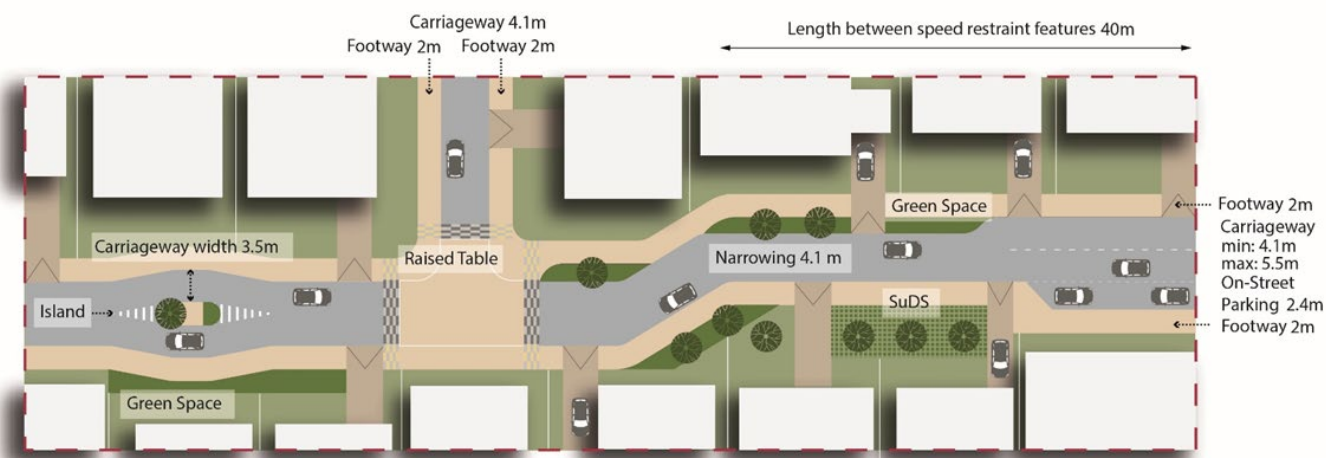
Street Typology Plan for a Local Street in a Coastal Context
